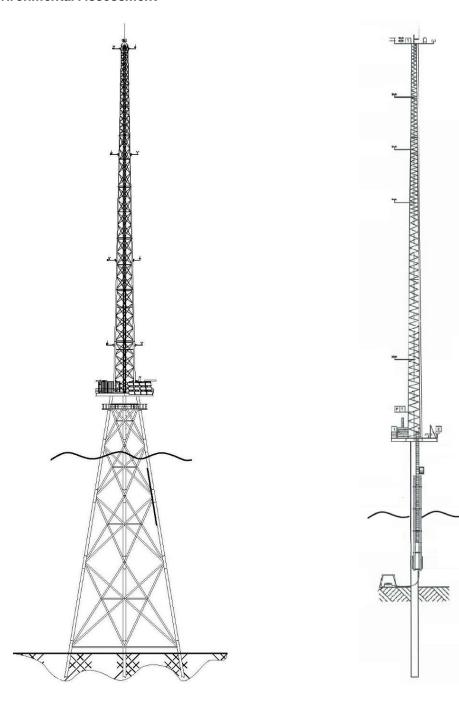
(a). Lattice-type Mast Mounted on a Steel Jacket Foundation Source: Fishermen's Energy of New Jersey, LLC as cited in USDOI, BOEM, OREP 2012.
